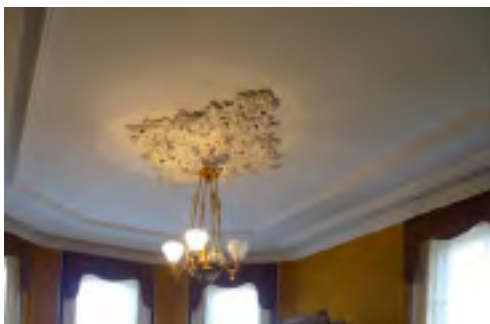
Decorative plaster ceiling in Southeast Bedroom BR 302
